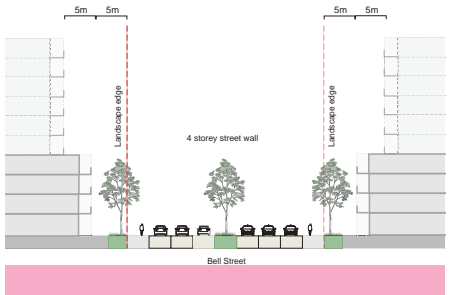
Bell Street, Bell Street Precinct. A 5m ground floor setback is proposed to manage amenity on this major road.
